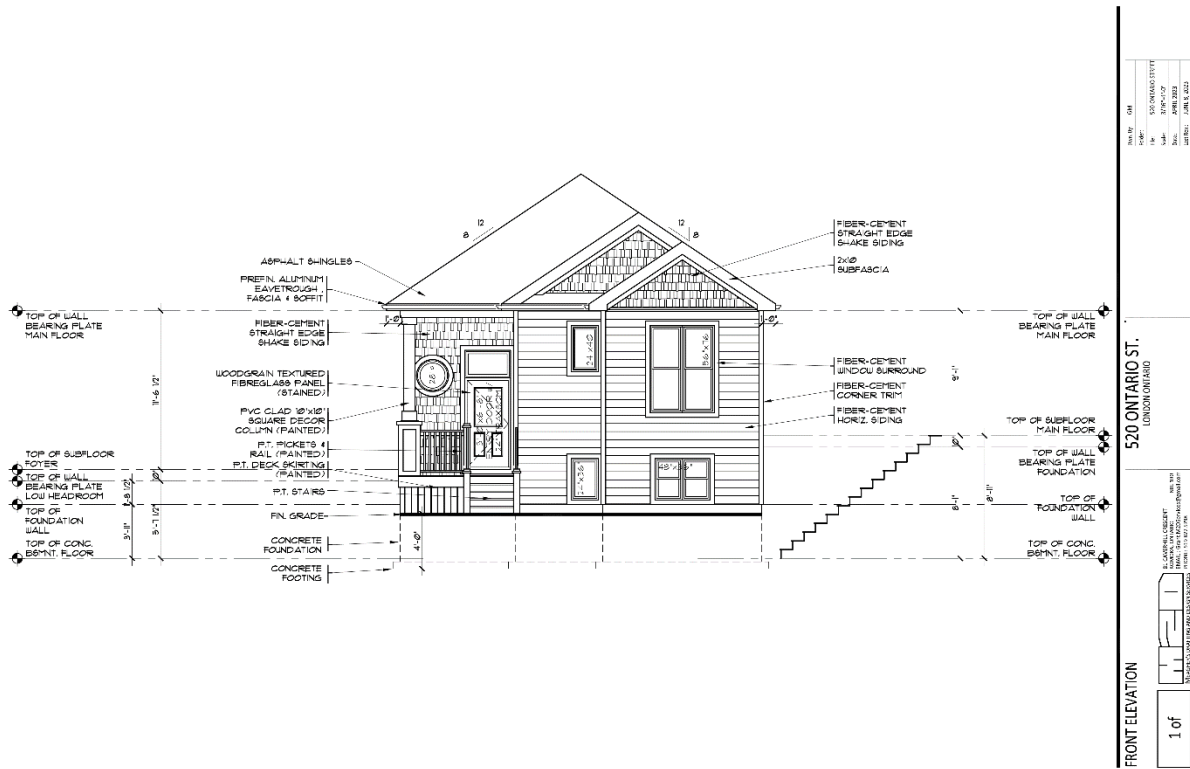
West elevation for proposed house on the subject property at 520 Ontario Street, Meaghers Drafting and Design Services, dated June 2023.
